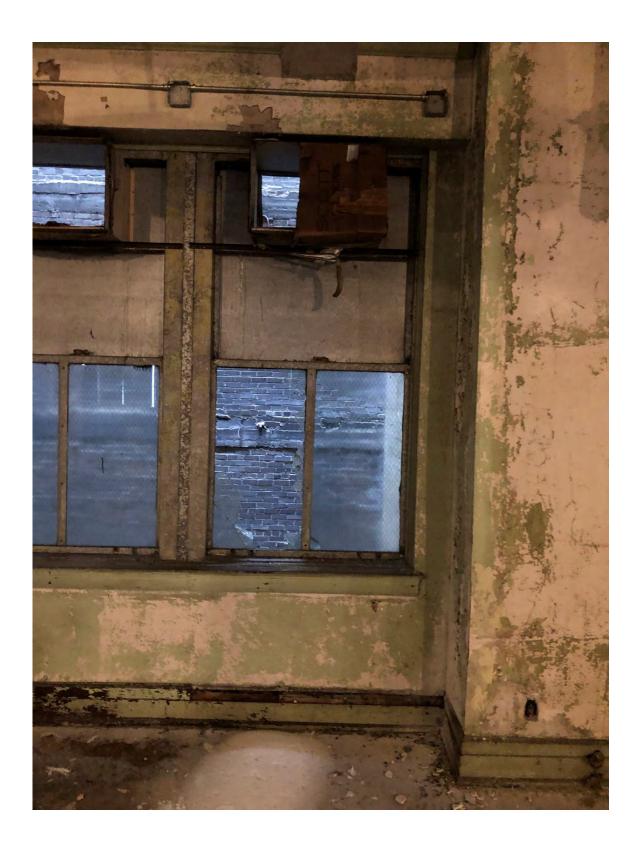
Interior, 7<sup>th</sup> Floor Lightwell Window, Looking West. 2/4/19
